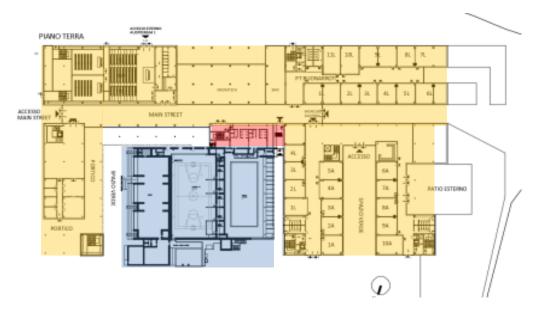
Design condition - General plan of the new educational facility and the remaining gym building
